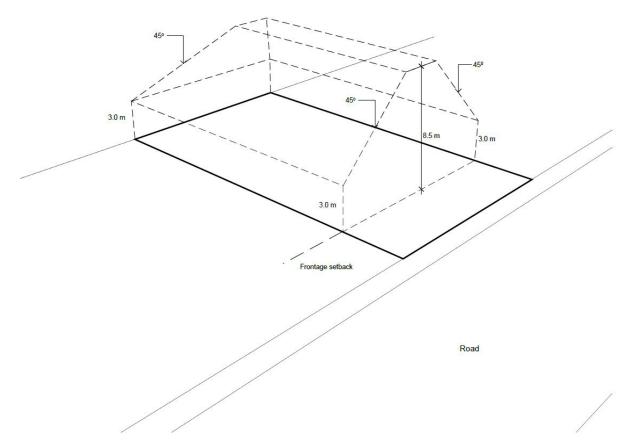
Building envelope as required by clause 10.4.2 A3(a)
